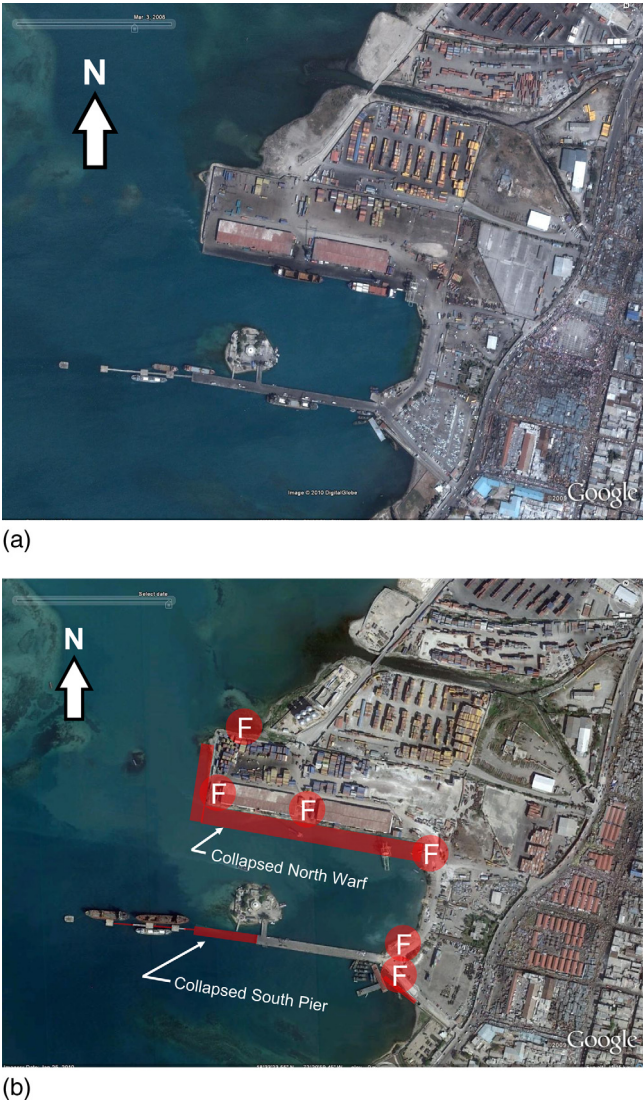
Aerial images of seaport at Port-au-Prince, (a) prior to earthquake; and (b) after the earthquake illustrating ground failures, marked with “F,” and damage to South Pier and North Wharf.
